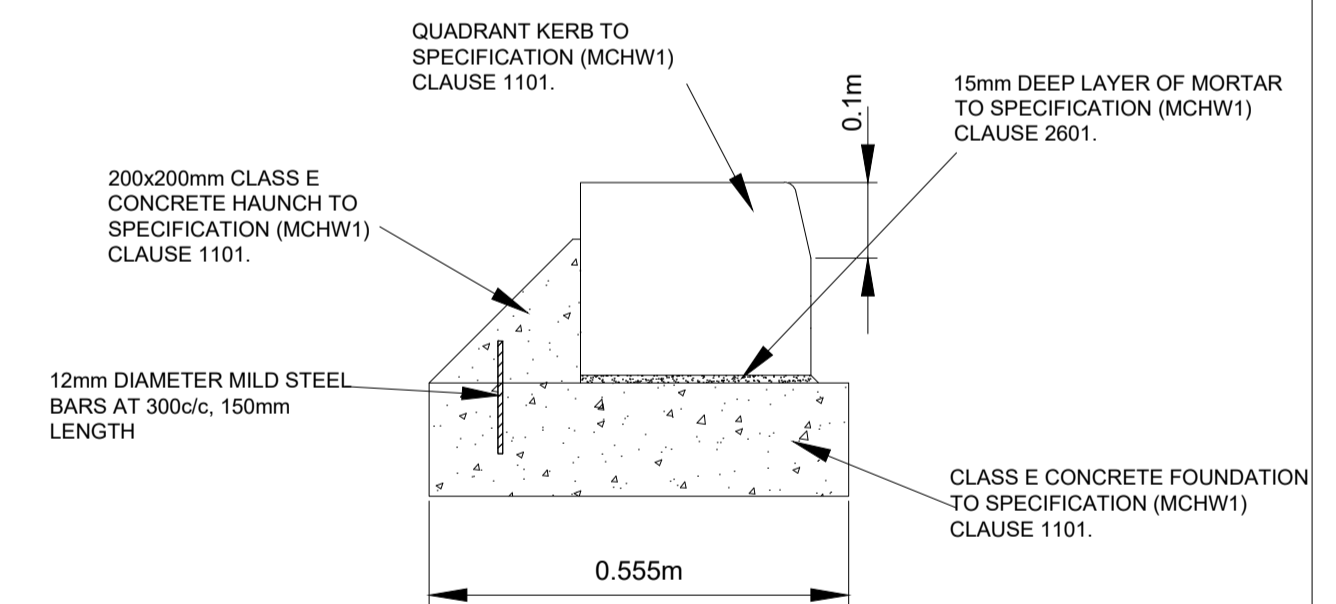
ROAD KERB BULLNOSE (1:10)
